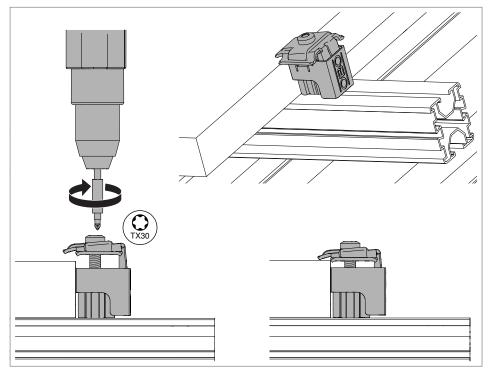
Screwing in the universal clamp as an end clamp on the right
